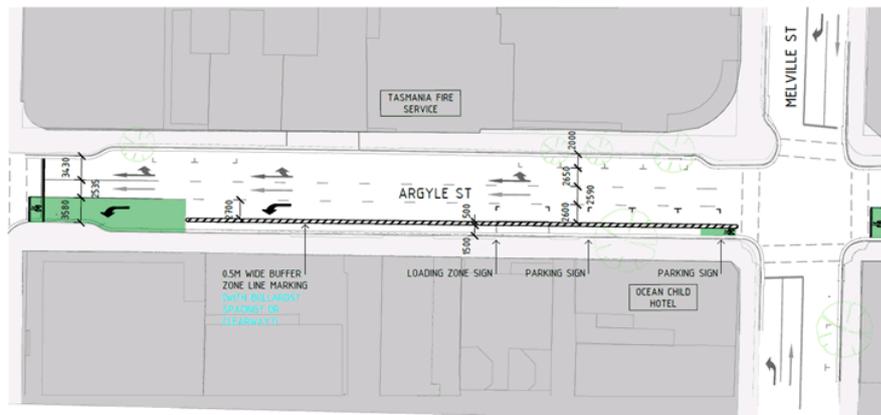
Argyle Street (Melville Street to Brisbane Street)
